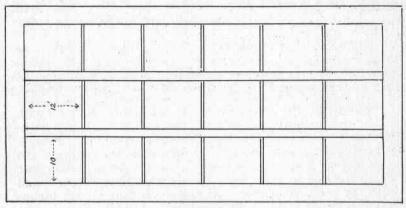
\_ Plan of 3X6 sash. See details elsewhere
